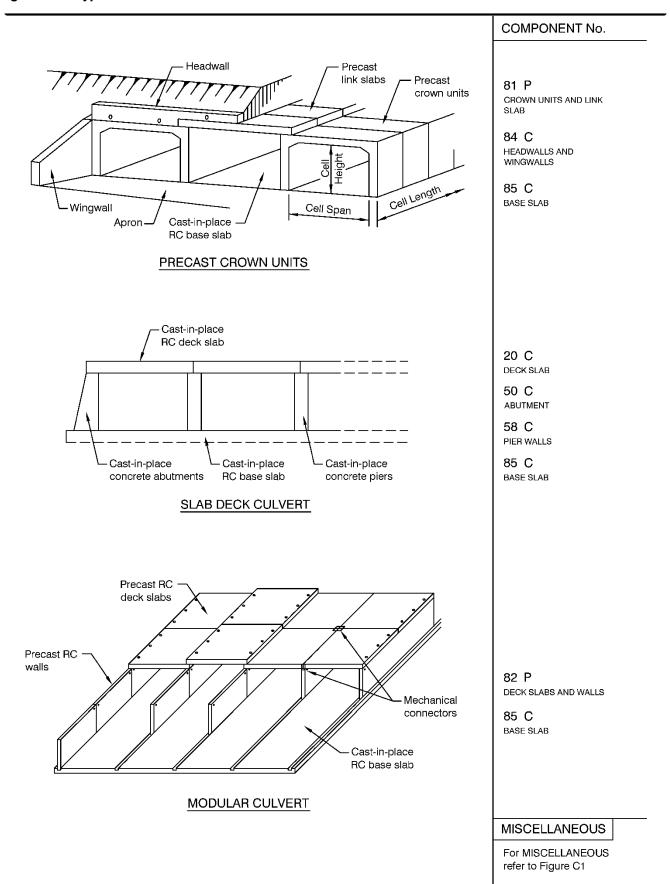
TYPICAL CONCRETE CULVERTS
